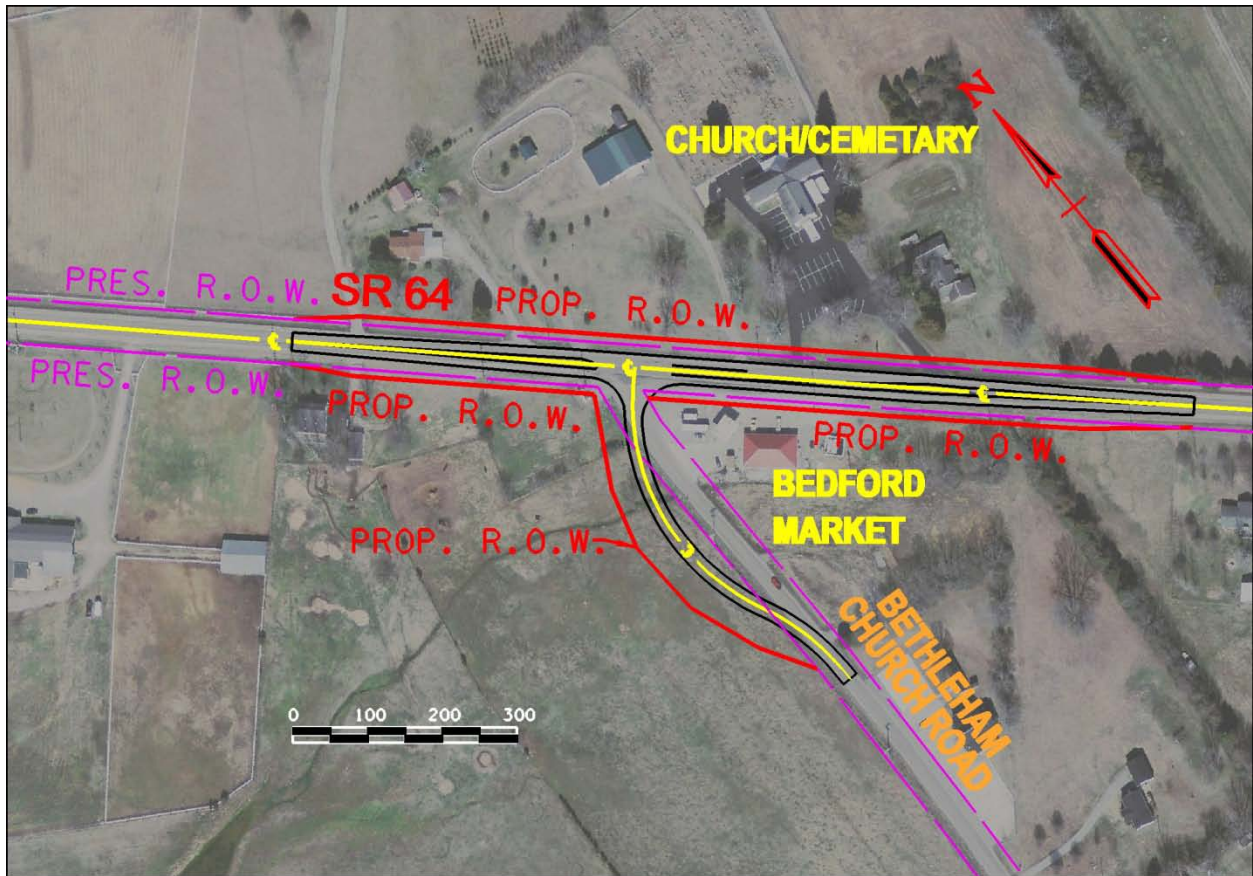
Plan View of Left Turn Lane at Bethlehem Church Road
